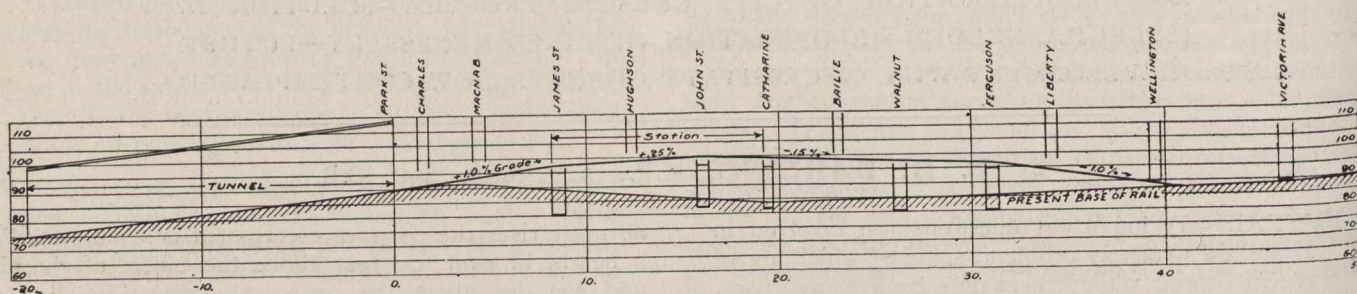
Profile of track elevation plan for the Toronto, Hamilton and Buffalo Railway, by Westinghouse, Church, Kerr and Company.
